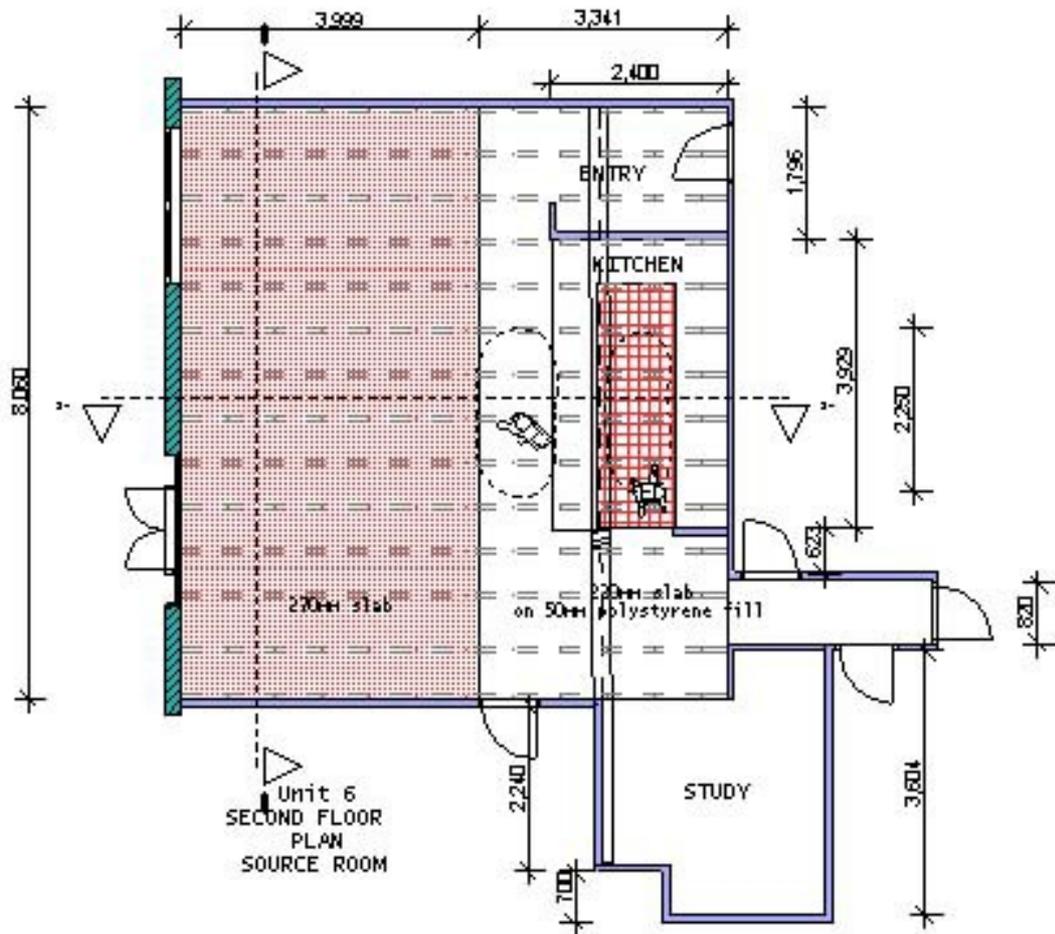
FLOOR PLAN SOURCE ROOM (not to scale)
